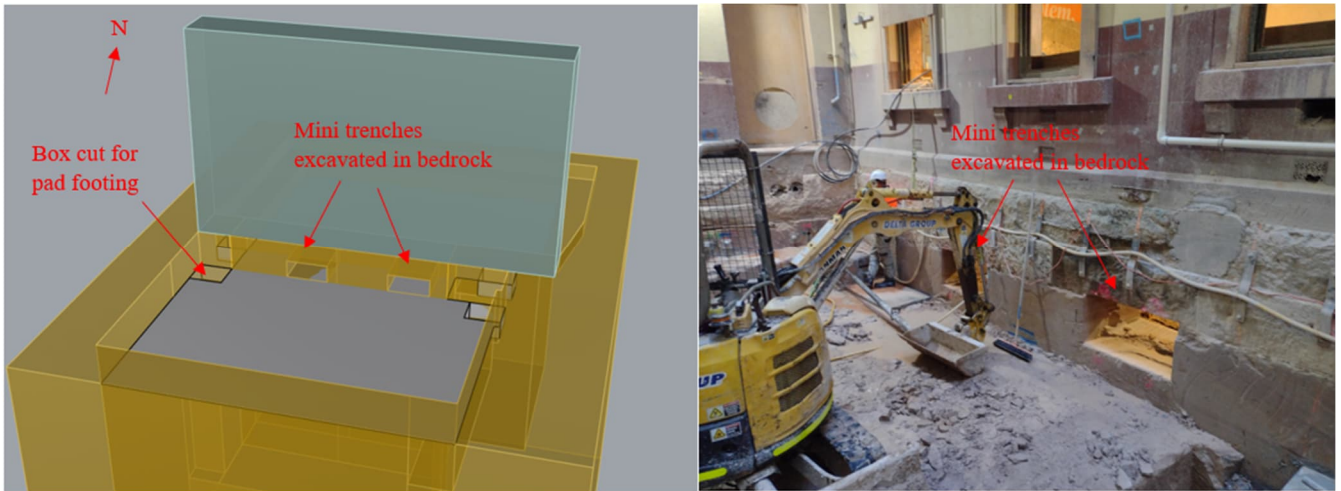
Pad footing and mini niche beam installation – 3D model isometric view (left) and site photography (right)
